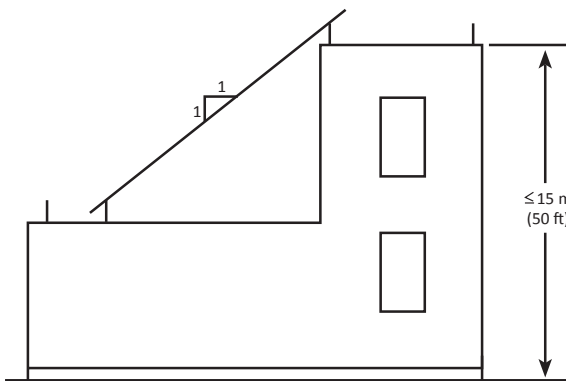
(a) Lower Roof Protection for Buildings 15 m (50 ft) or Less in Height.
